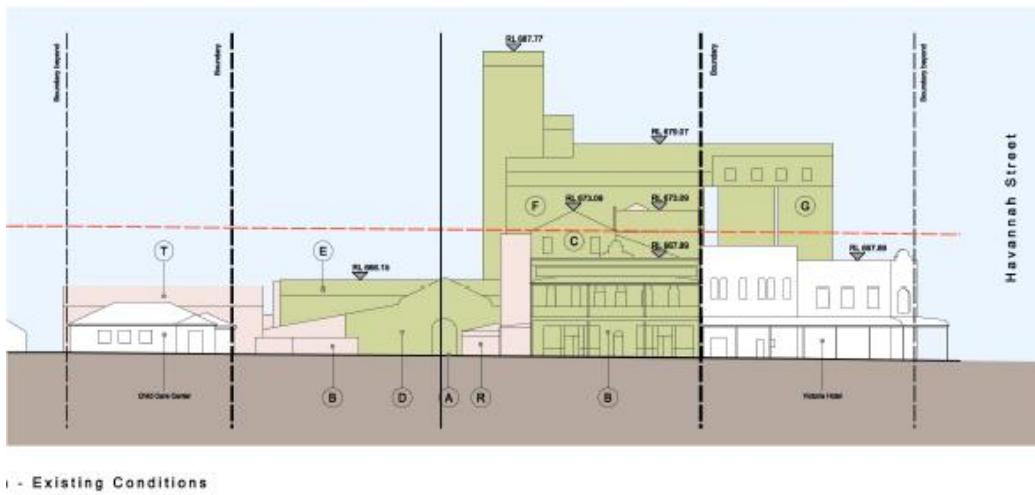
Keppel Street elevation (Source: Karl Walls Design)
